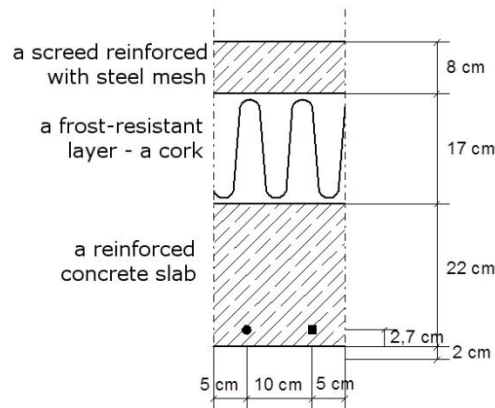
Cross-section of the reinforced concrete ceiling section of a cold storage building in Wloclawek
